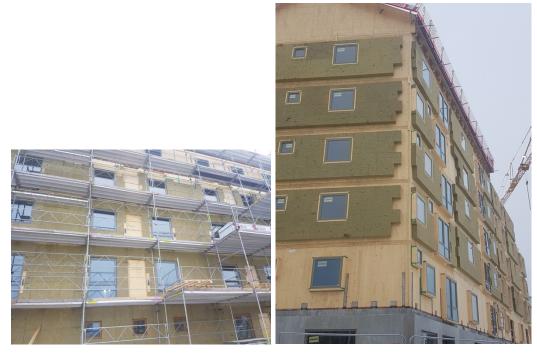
example of a building with a solid wood enclosure by means of CLT (picture courtesy Petter Wallentén)
